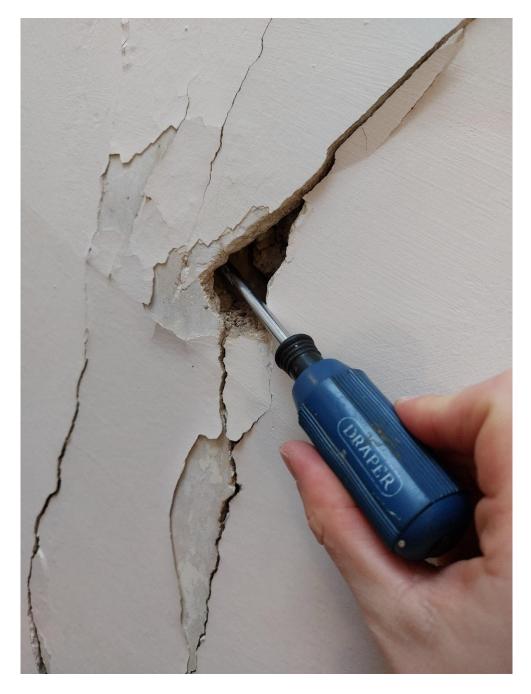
Plaster has delaminated from masonry behind locally at the bulge in the crack. Cracking did not appear to extend into masonry behind on probing
